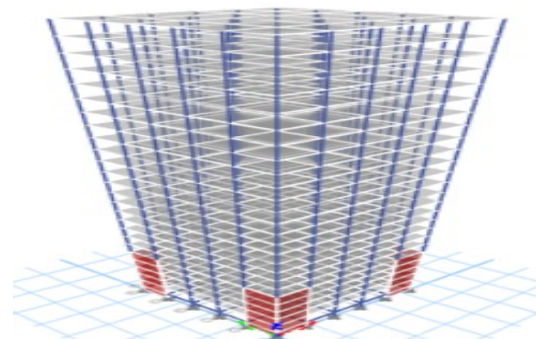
D View of RC framed structure shear wall (From base to 5th story)
